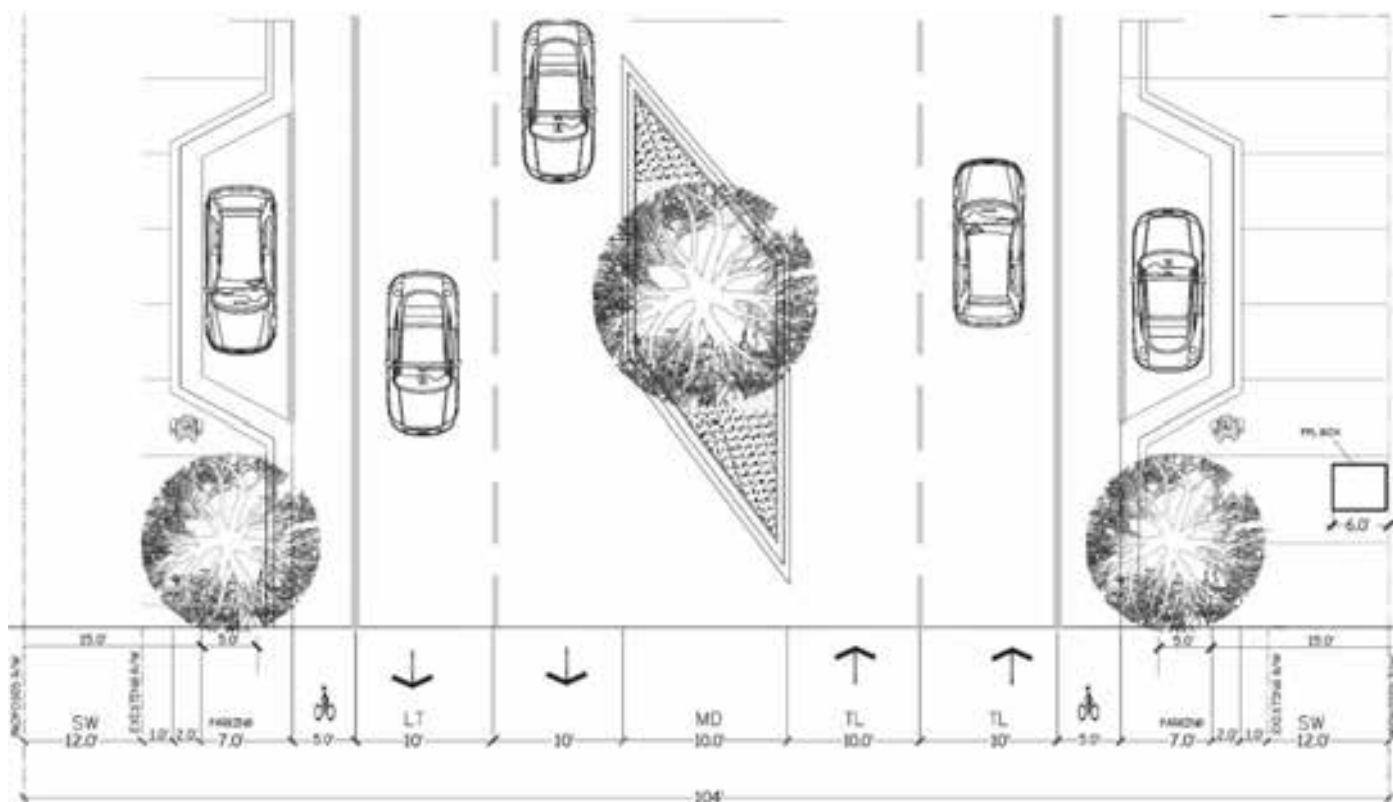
Boynton Beach Blvd. Plan from Seacrest Blvd. to Federal Hwy.
